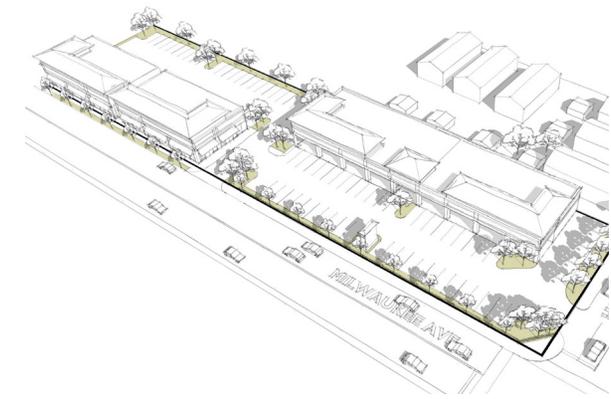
COMPONENT B: BUILDING SITING IMPROVEMENTS
